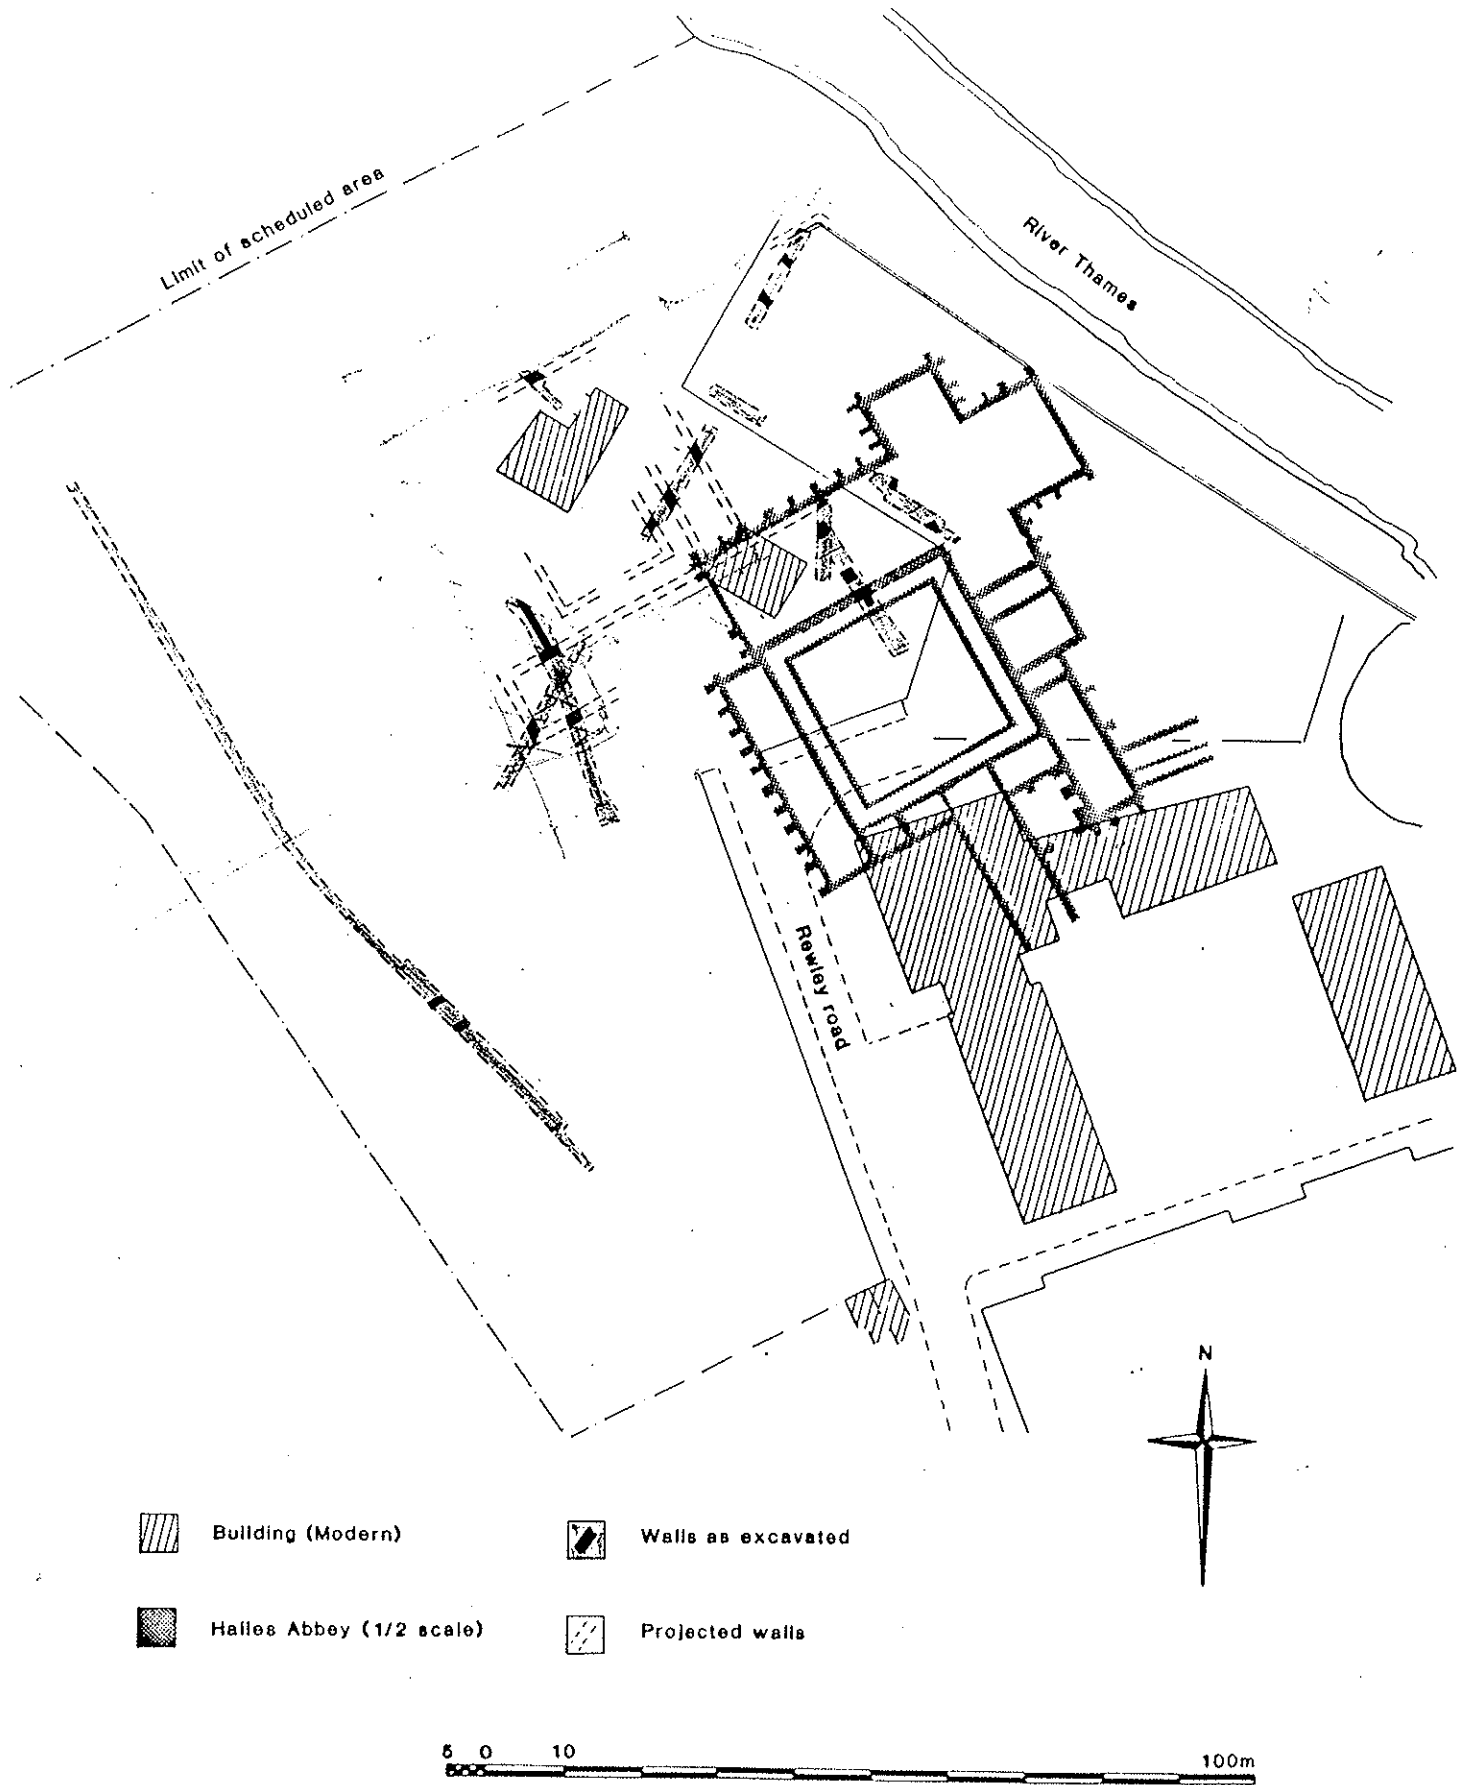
Plan showing conjectural reconstruction of parts of the abbey and studium, with a half scale plan of Hailes Abbey superimposed.
